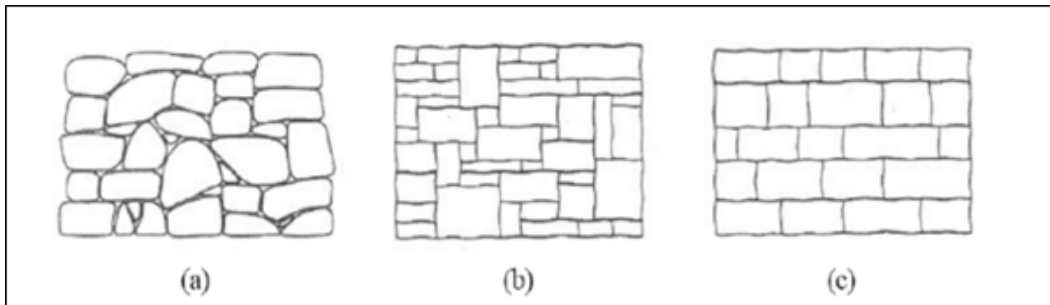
Masonry stone walls a) Rubble stone, b) Cut stone, c) Lined Cut Stone (Lourenço, 1998).
